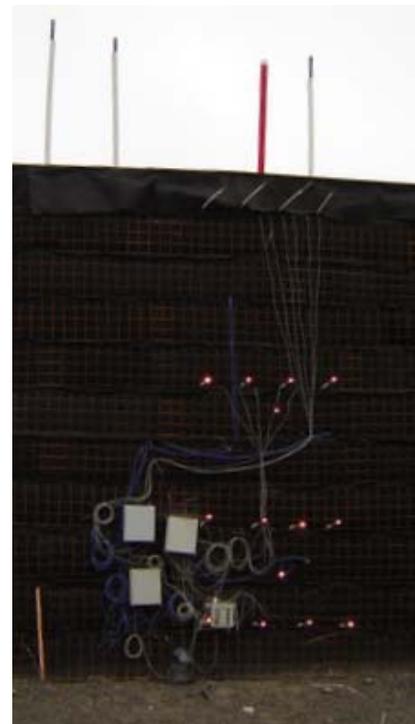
Wall face showing reflective prism survey targets (glowing). Note red inclinometer casing and settlement plate pipes rising above top of wall.
